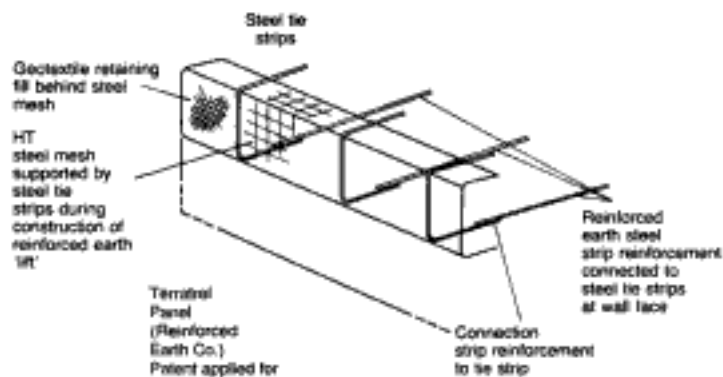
Terratrel panel for use in steep slope construction (courtesy of Reinforced Earth Ltd)
